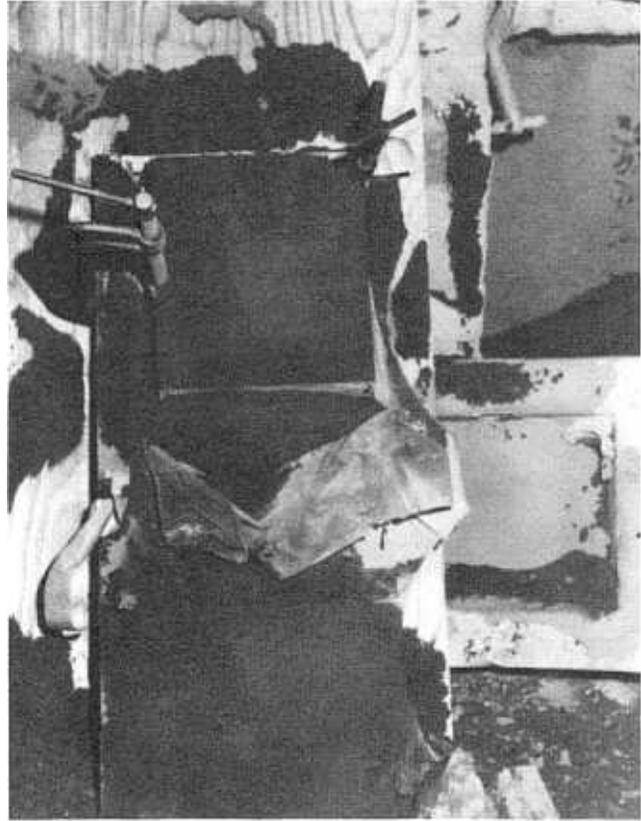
Fresh soil-fly ash-cement specimens formed pneumatically. P-801-D-81078
